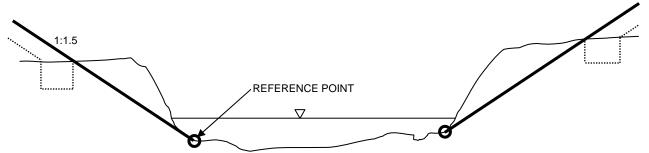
Reference points for slopes steeper than 1:1.5 where bank stability may be a concern.
